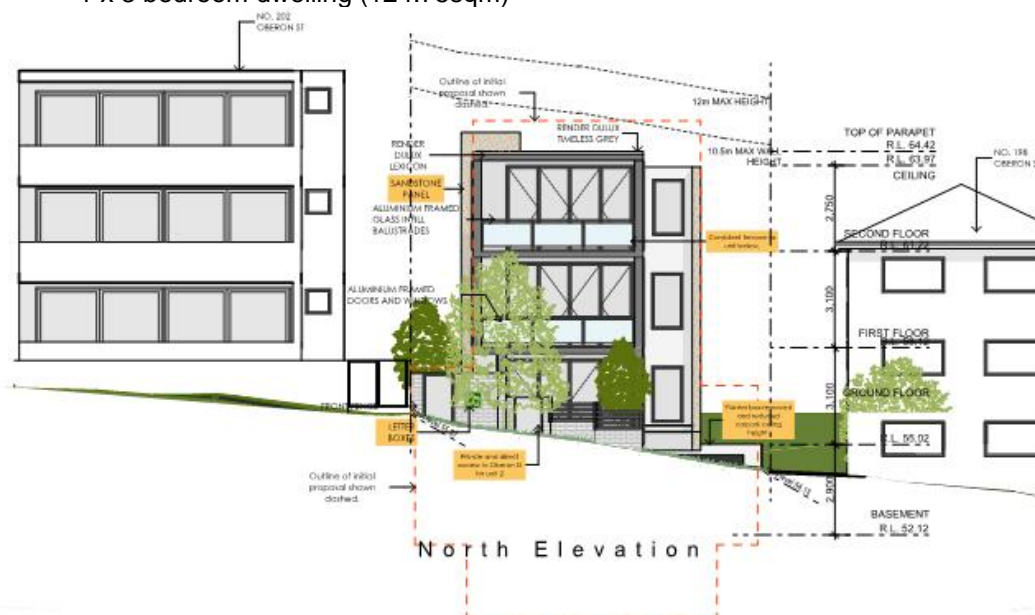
proposed development at the front as amended showing a reduced size and scale compared with the dashed outline of the original proposal. At left is a more recent development at No. 202 Oberon Street and at right is the walk up flat building at No. 198 Oberon Street.
